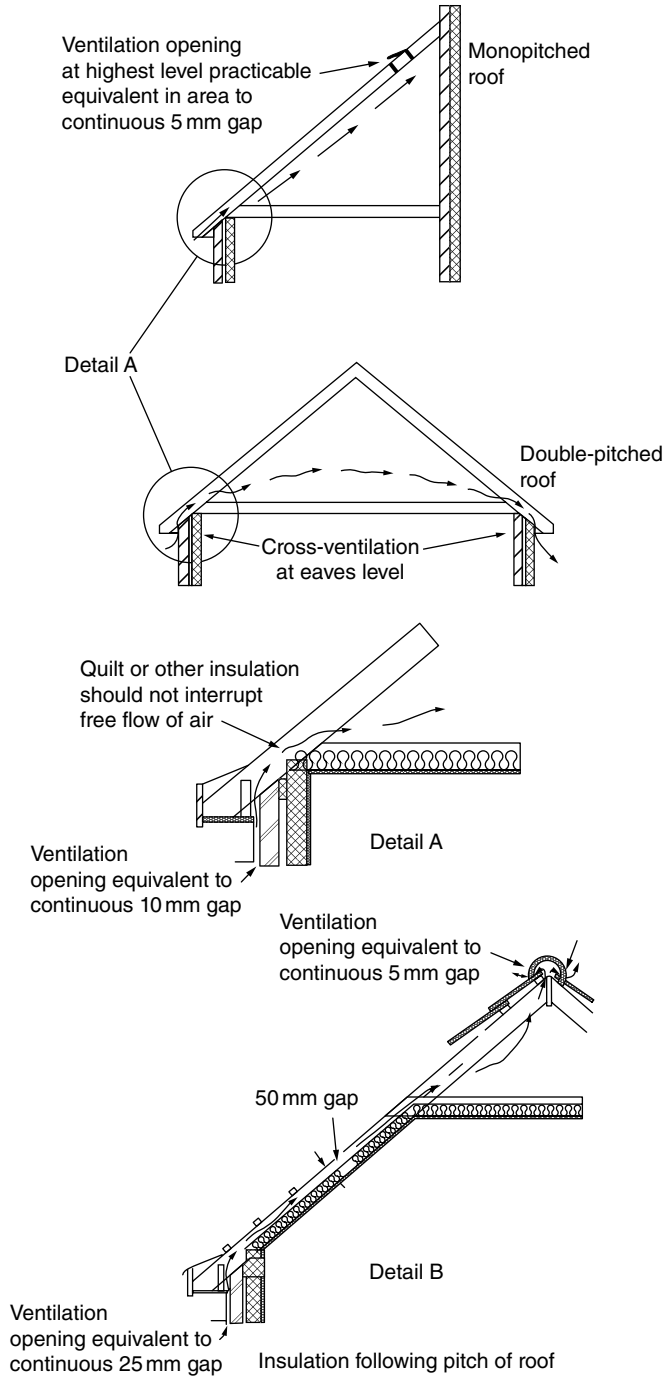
Roof void ventilation – roofs pitched at 15° or more.
